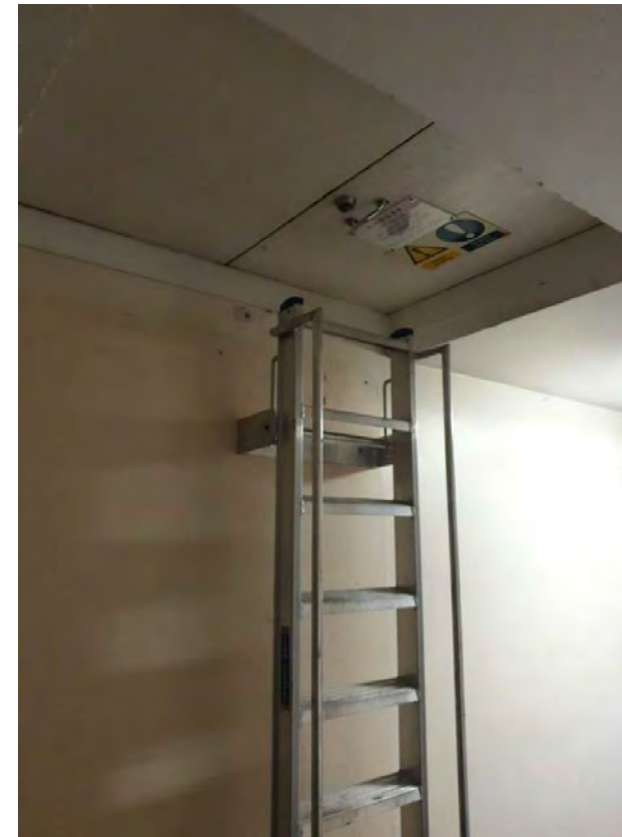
Fixed ladder to plant area in L7 Staircase 26
